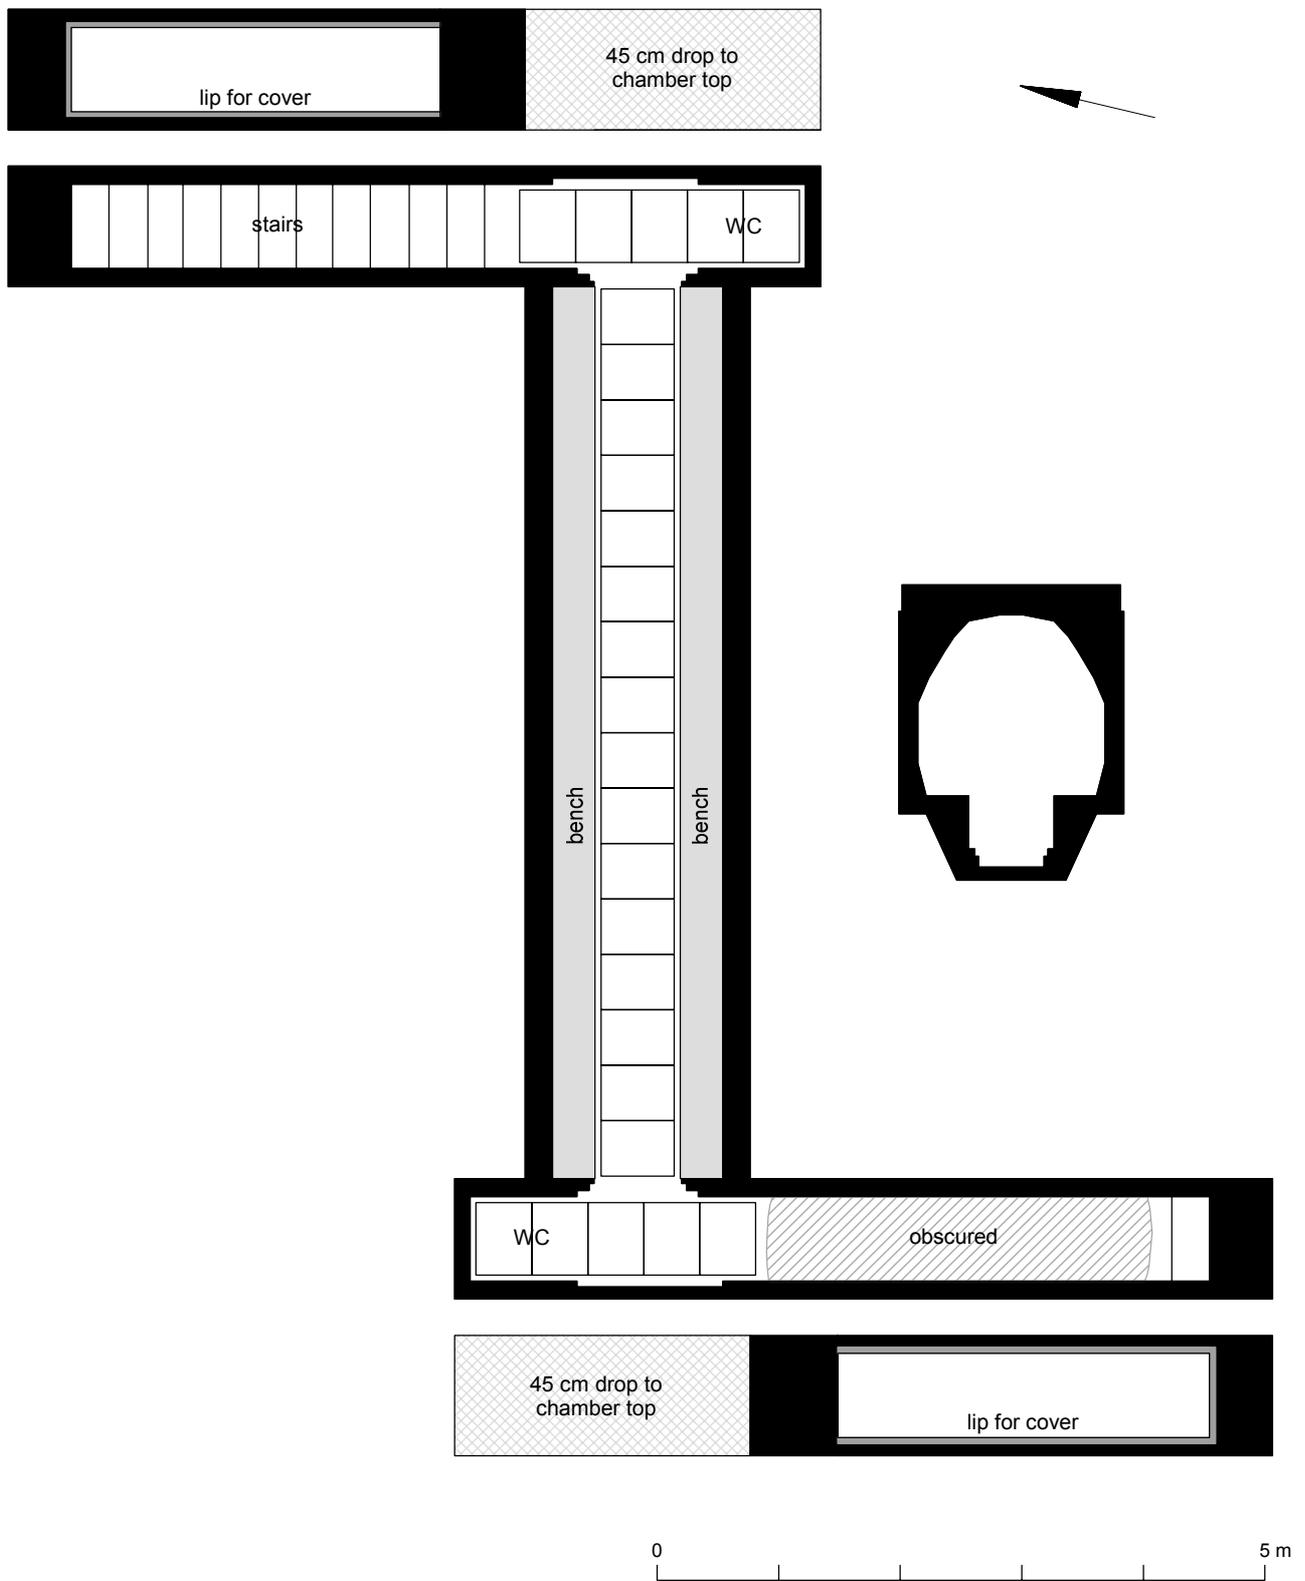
Area J1, air-raid shelter F10: internal plan and cross-section of chamber.
